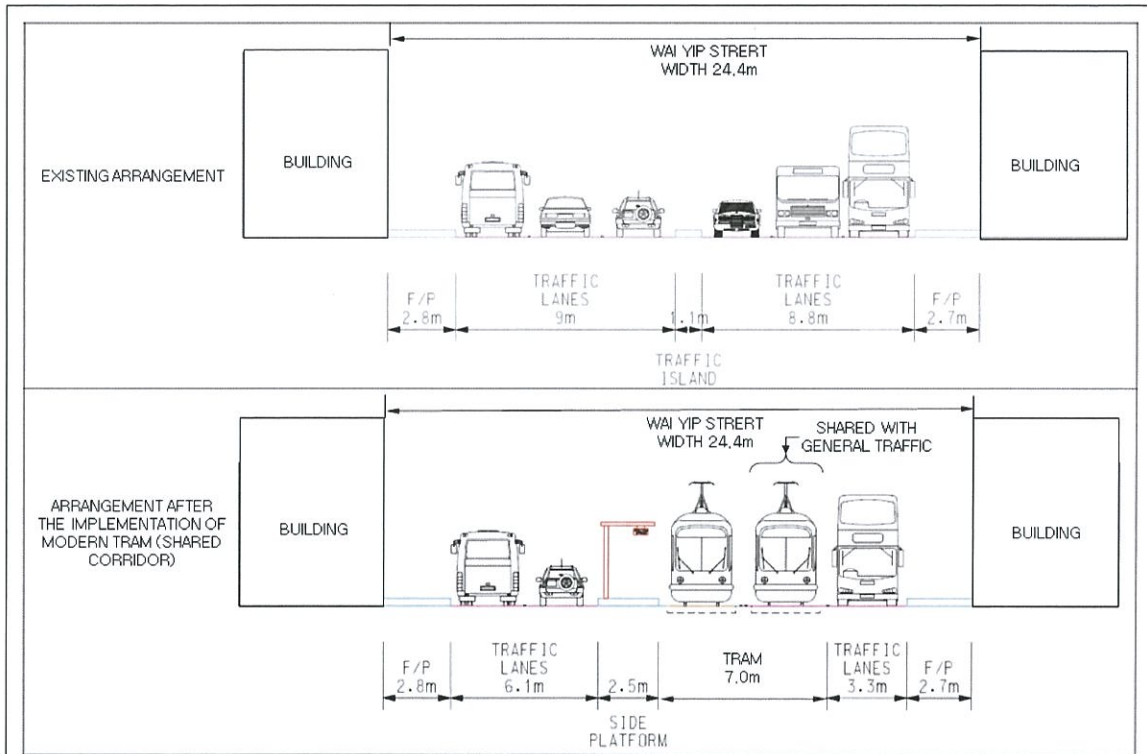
Typical Cross Section Plan of Option 2 (At-Grade Shared Corridor) on Wai Yip Street (Before and After Implementation)
